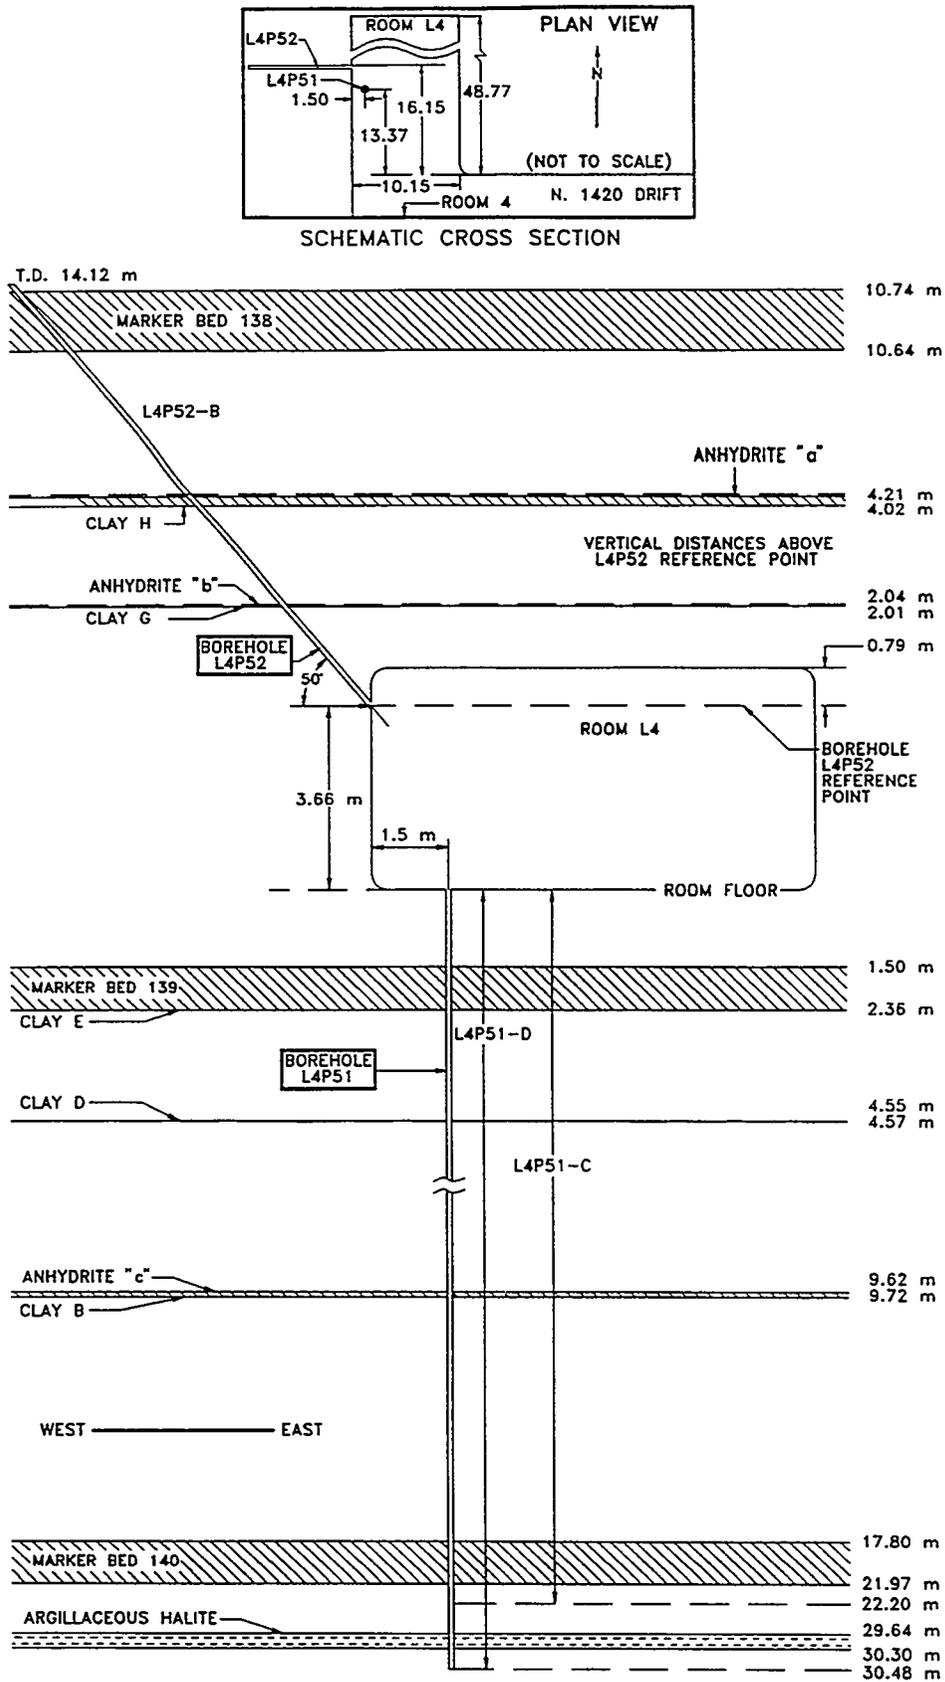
schematically depicts Room L4 in plan view and in cross section, showing the locations and orientations of boreholes L4P51 and L4P52. Figure 3-21 schematically depicts Waste Panel 1, Room 7 in plan view and in cross section, showing the location and orientation of borehole S1P74.
